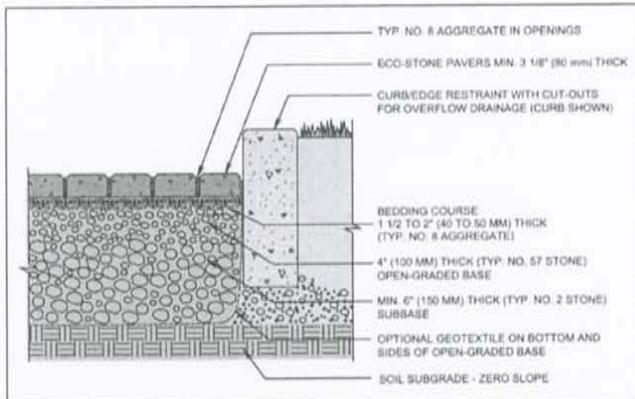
Typical Cross-Section of an Eco-Stone® Permeable Pavement Full Exfiltration
